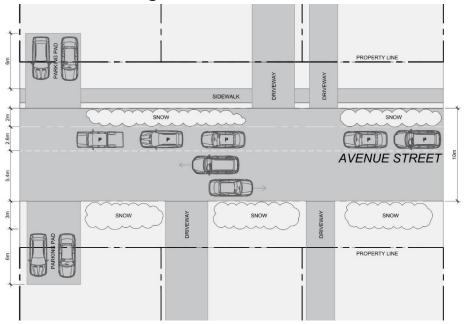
Front Parking Pads on an 10m wide street with sidewalks
